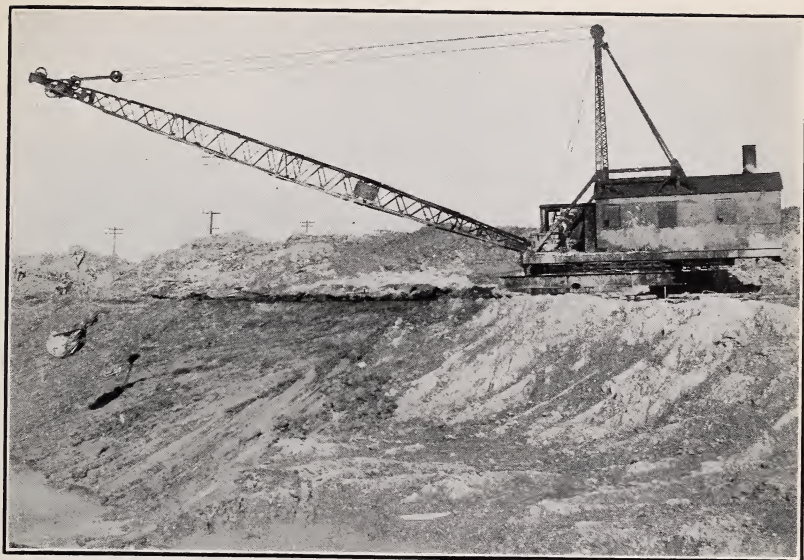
DRAG-SCRAPER EXCAVATOR USED ON NEW YORK BARGE CANAL.
